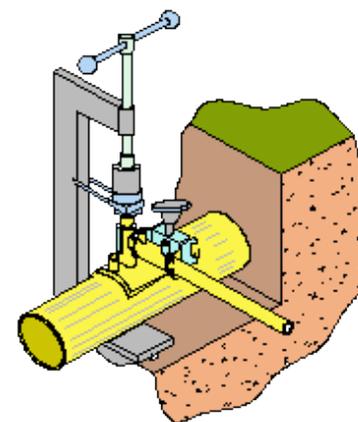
Clamping fitting to main & coupler to tee/pipe
